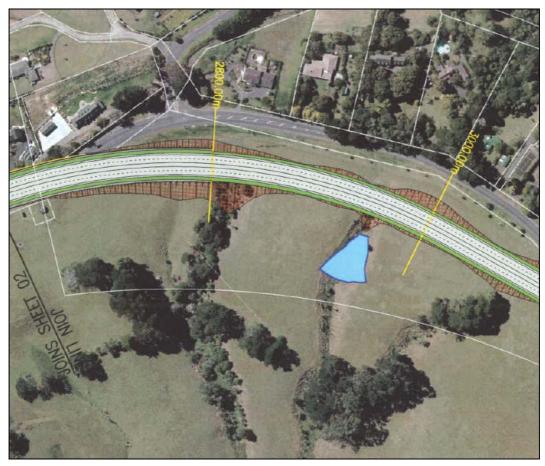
Proposed realignment of Options C & D at Totara Park, showing infill of gully heads and proposed stormwater storage pond
